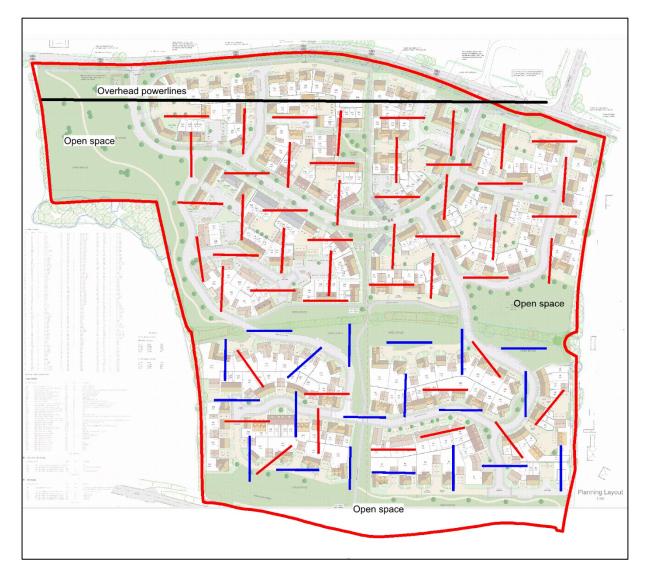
Proposed trench plan overlaid onto extract of Hopkins Homes development plan
